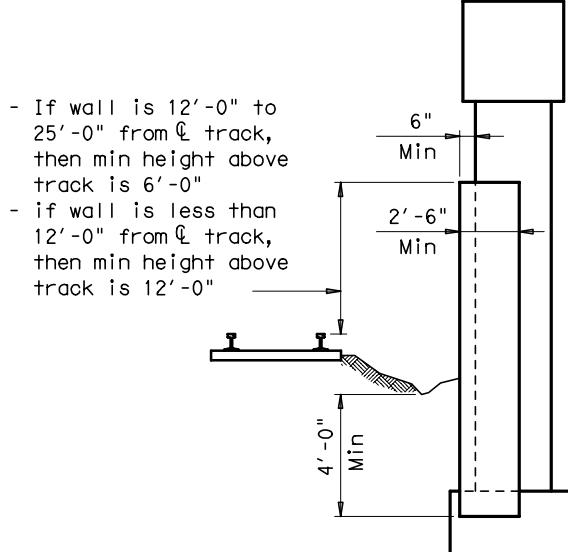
Railway Crash Wall Parameters Bent End Elevation. Online users can click 4-14 to view this illustration in PDF.
